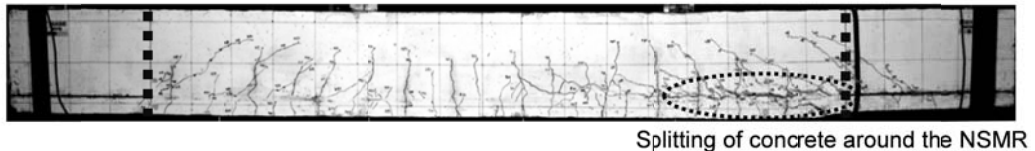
End debonding failure of beams NSM4Aa-NSM7Aa
